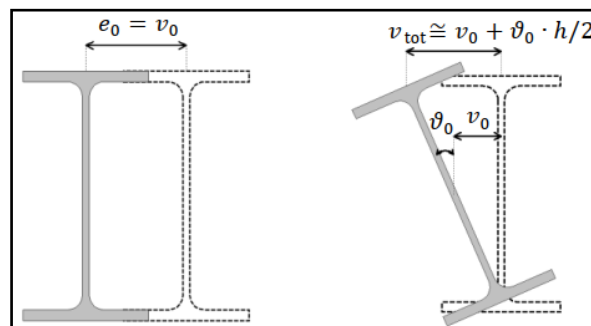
Determination of geometric imperfections, occurring in the operated damaged beam
